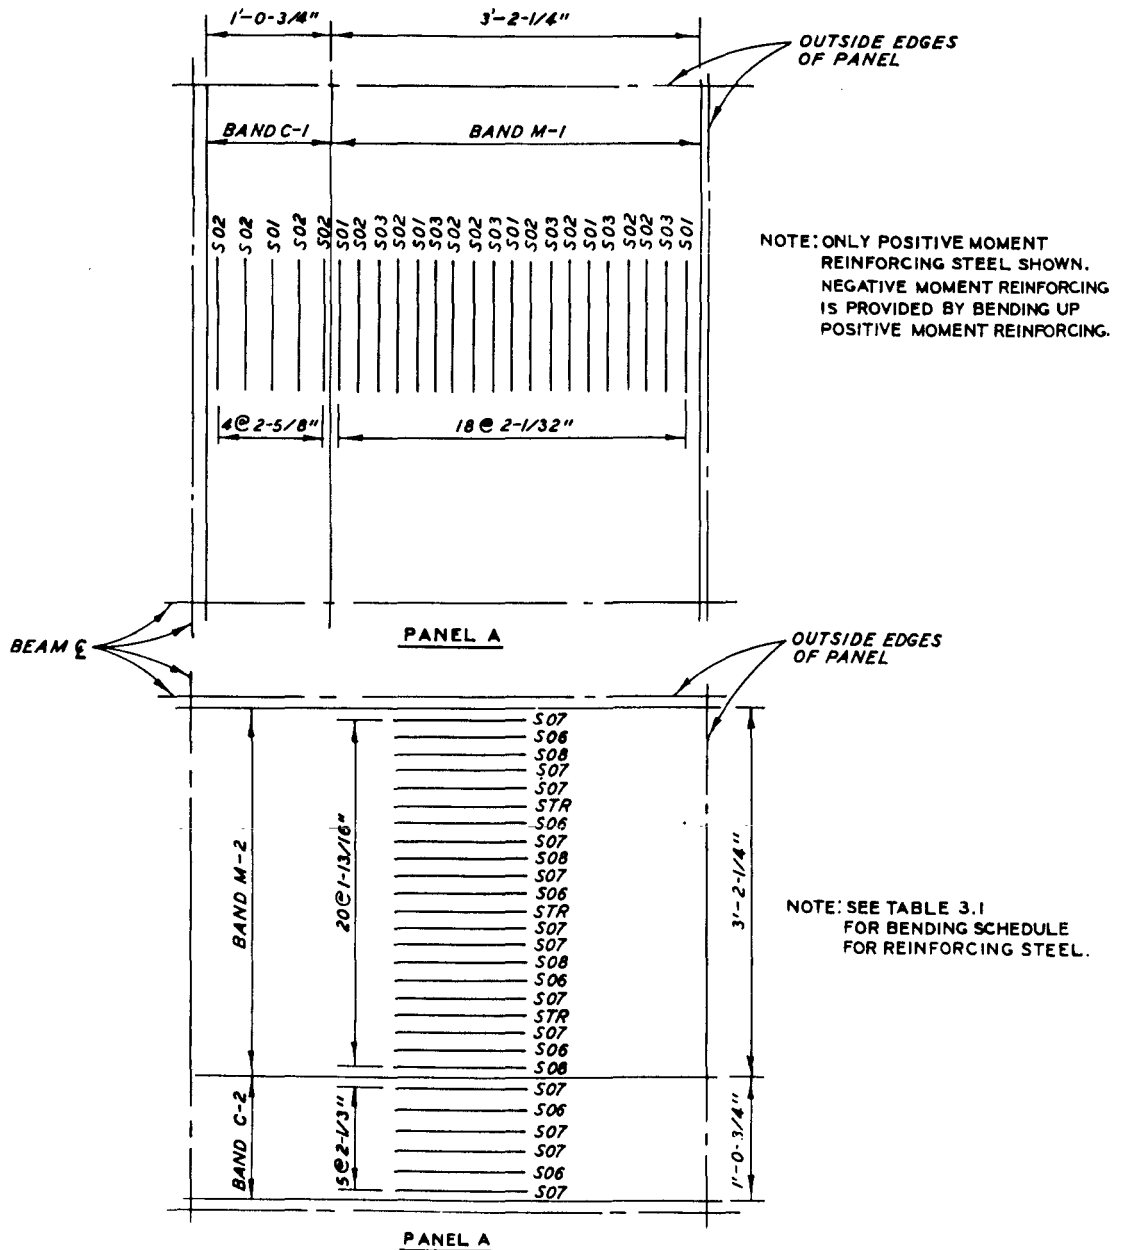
Reinforcing steel layout (sheet 1 of 5).
